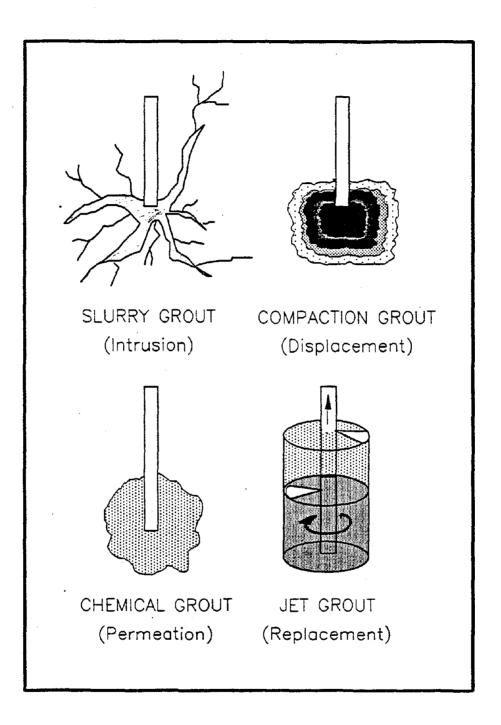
Types of grouting (courtesy of Hayward Baker Co.)
